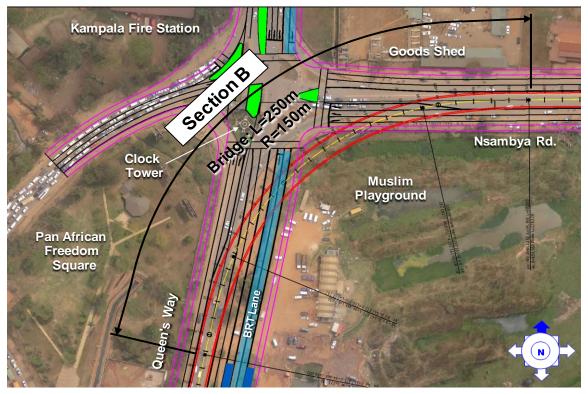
Section B: Curved section at Clock Tower Junction Source: JICA Progress Report 2
